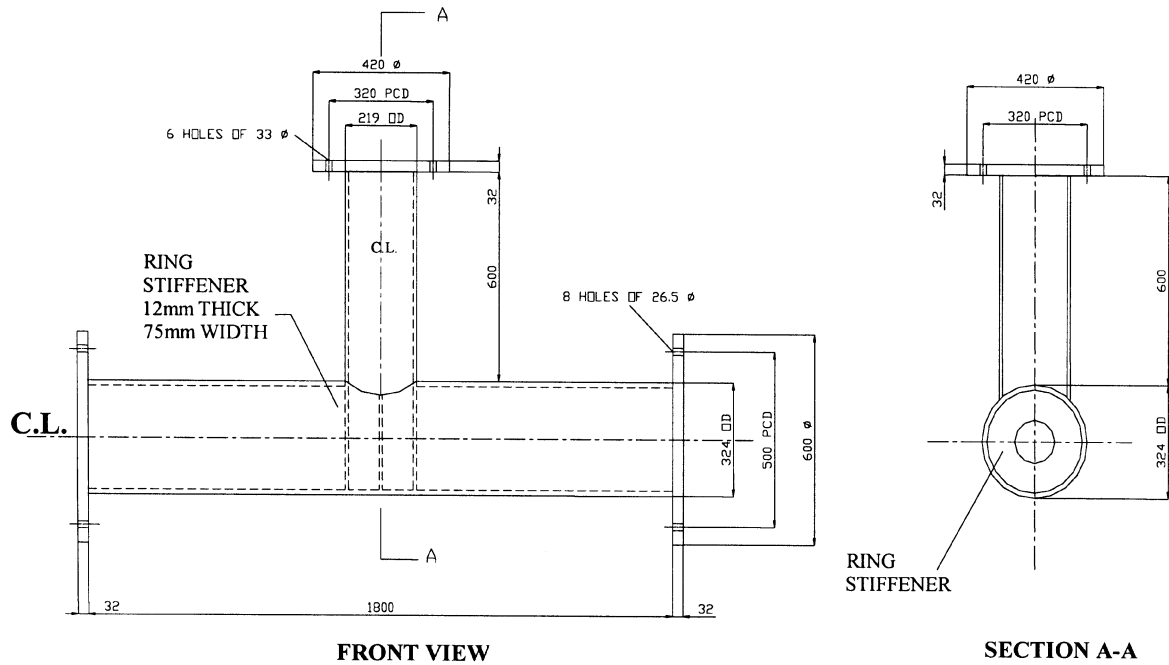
Dimensions of typical internally ring-stiffened T-joint
